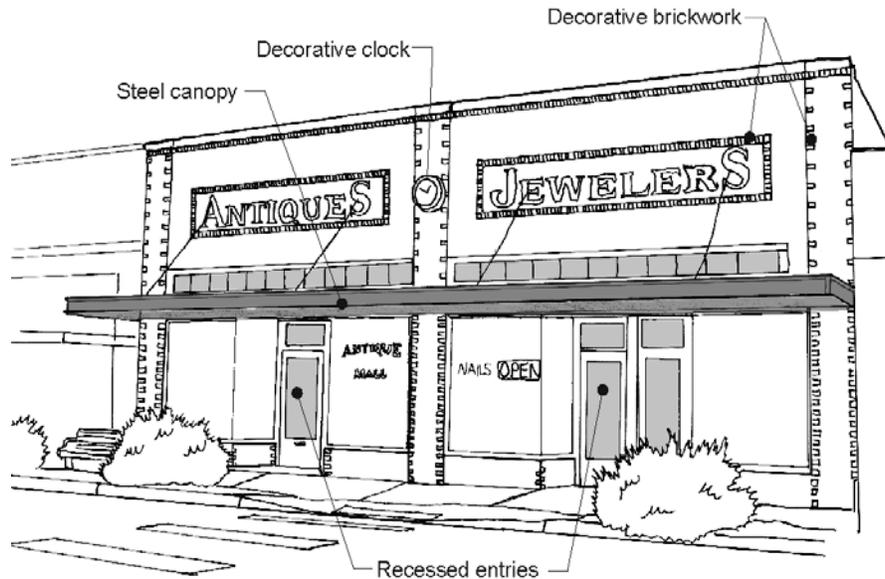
This older Downtown building would meet the current standards by including transom windows, a recessed entry, a steel canopy, a decorative clock, and decorative brickwork.
